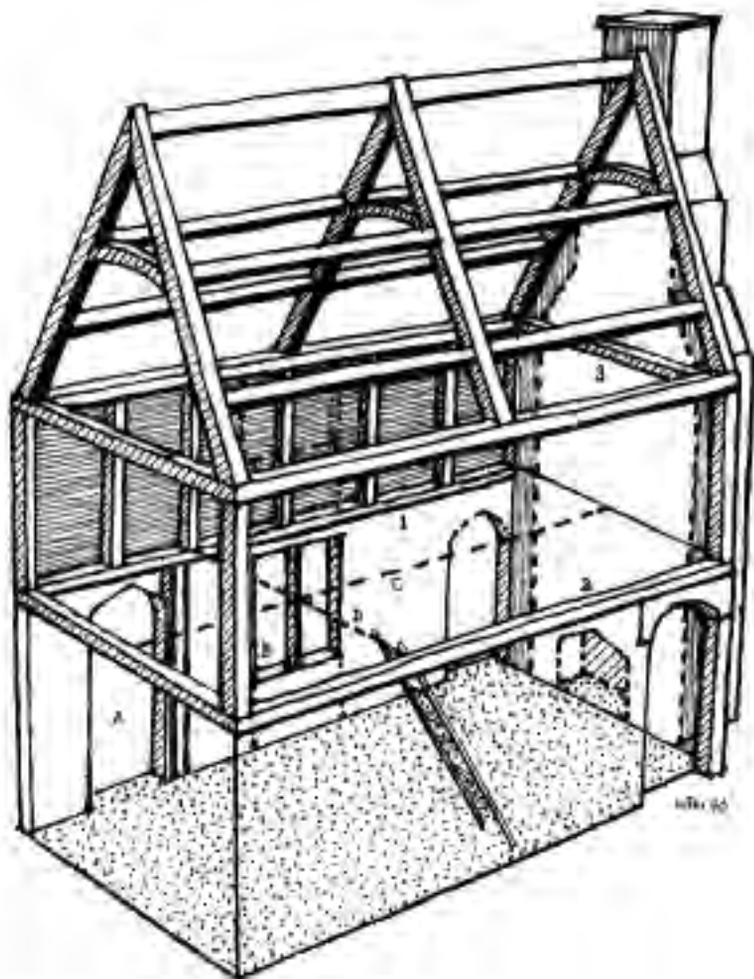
The house with the roof plates (1 and 2) in position but acting as wall plates supporting a timber-framed upper hall above a stone undercroft. A third beam (3) surviving in the west wall, perhaps another roof plate, is shown. The important 16th century doorway (A) is now a cupboard. The window (B) partly remains. A great longitudinal beam (C) supports the floor joists of the upper chamber (D). It is anchored at its W end in the great chimney as today. Here the latter is presumed to have been added before the extra wing in 1616, but this is hypothesis. Access to the upper chamber, used as a store or loft, would have been by a ladder or simple wooden steps with open treads.
